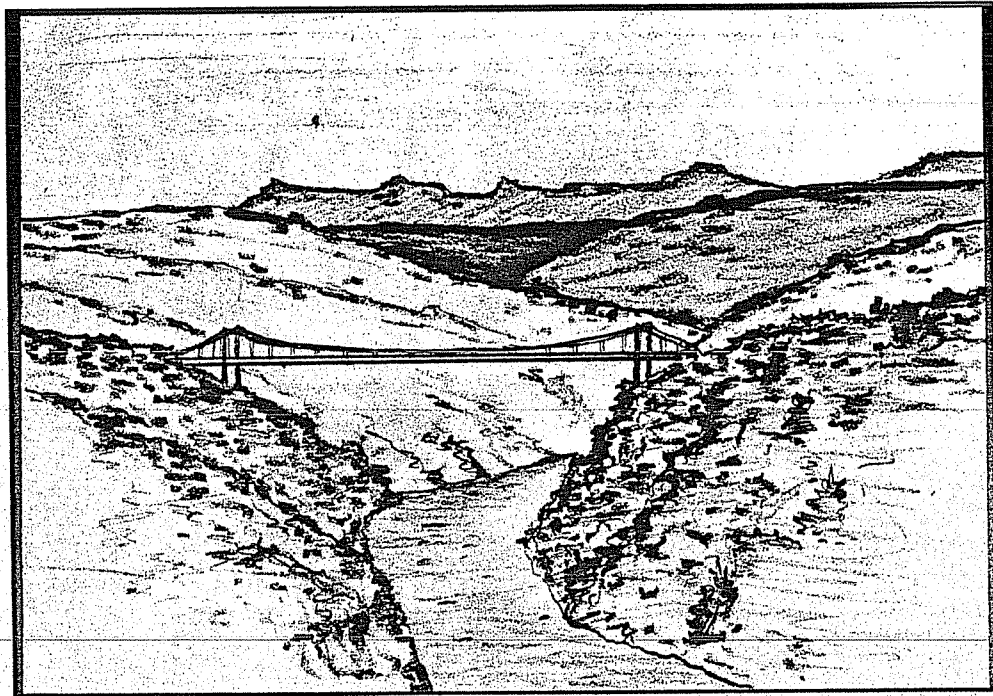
PROPOSED HIGH LEVEL BRIDGE AT DEVIL CANYON
